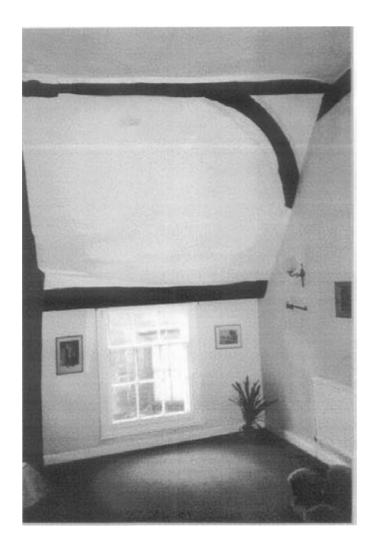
45 High Street East interior showing part of the open hall bracing.
